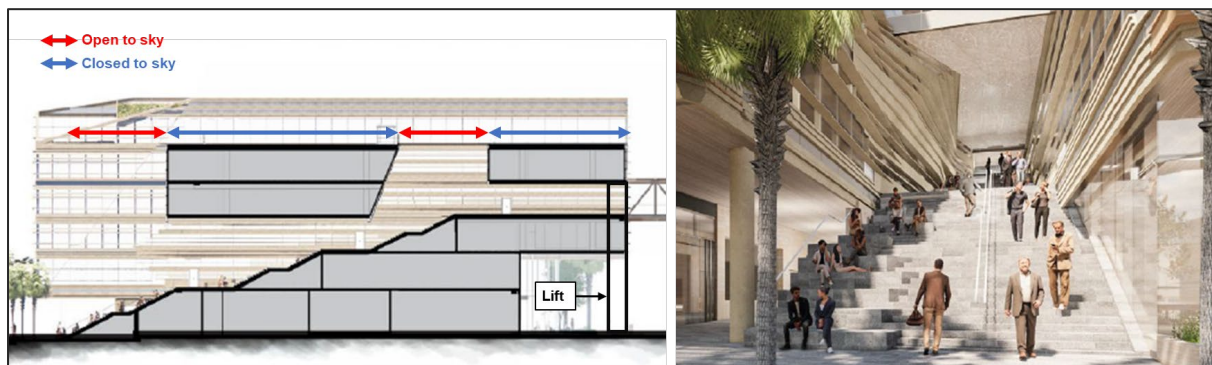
| Proposed open and covered components of the Bunn Street through site link (Base source: Applicant's Modification application)
